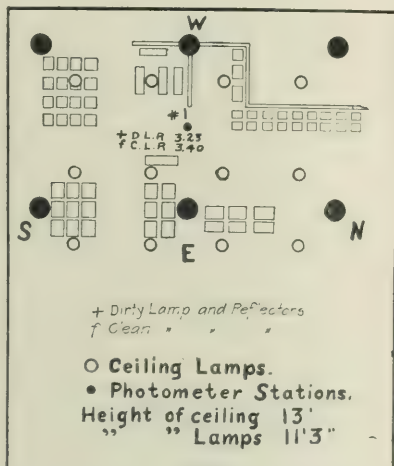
Section plan of fifth floor, (household furnishings), showing location of furniture, pillars, lighting units, test stations and illumination data.
